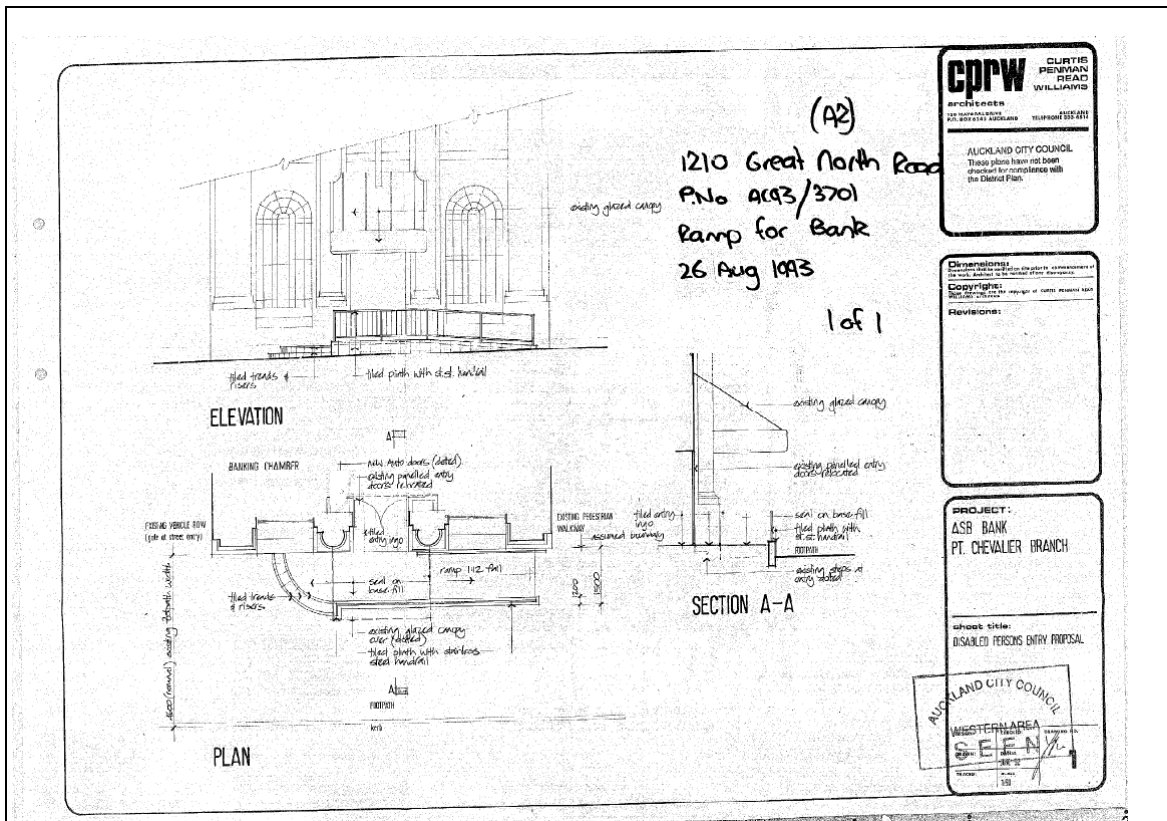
Auckland Savings Bank Point Chevalier Branch: Ramp addition 1993. Auckland Council Archives. Permit No. AC93/3701
